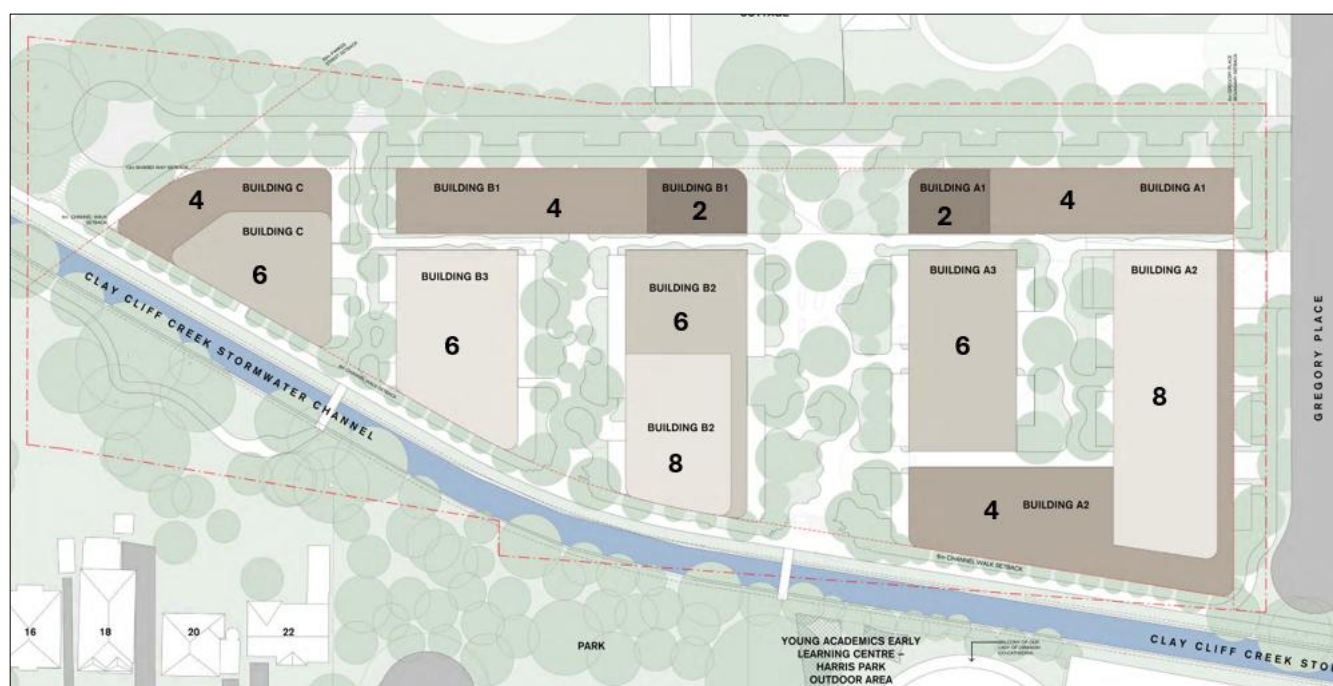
| Concept site layout with number of storeys labelled (Source: Applicant's Amendment Report)
